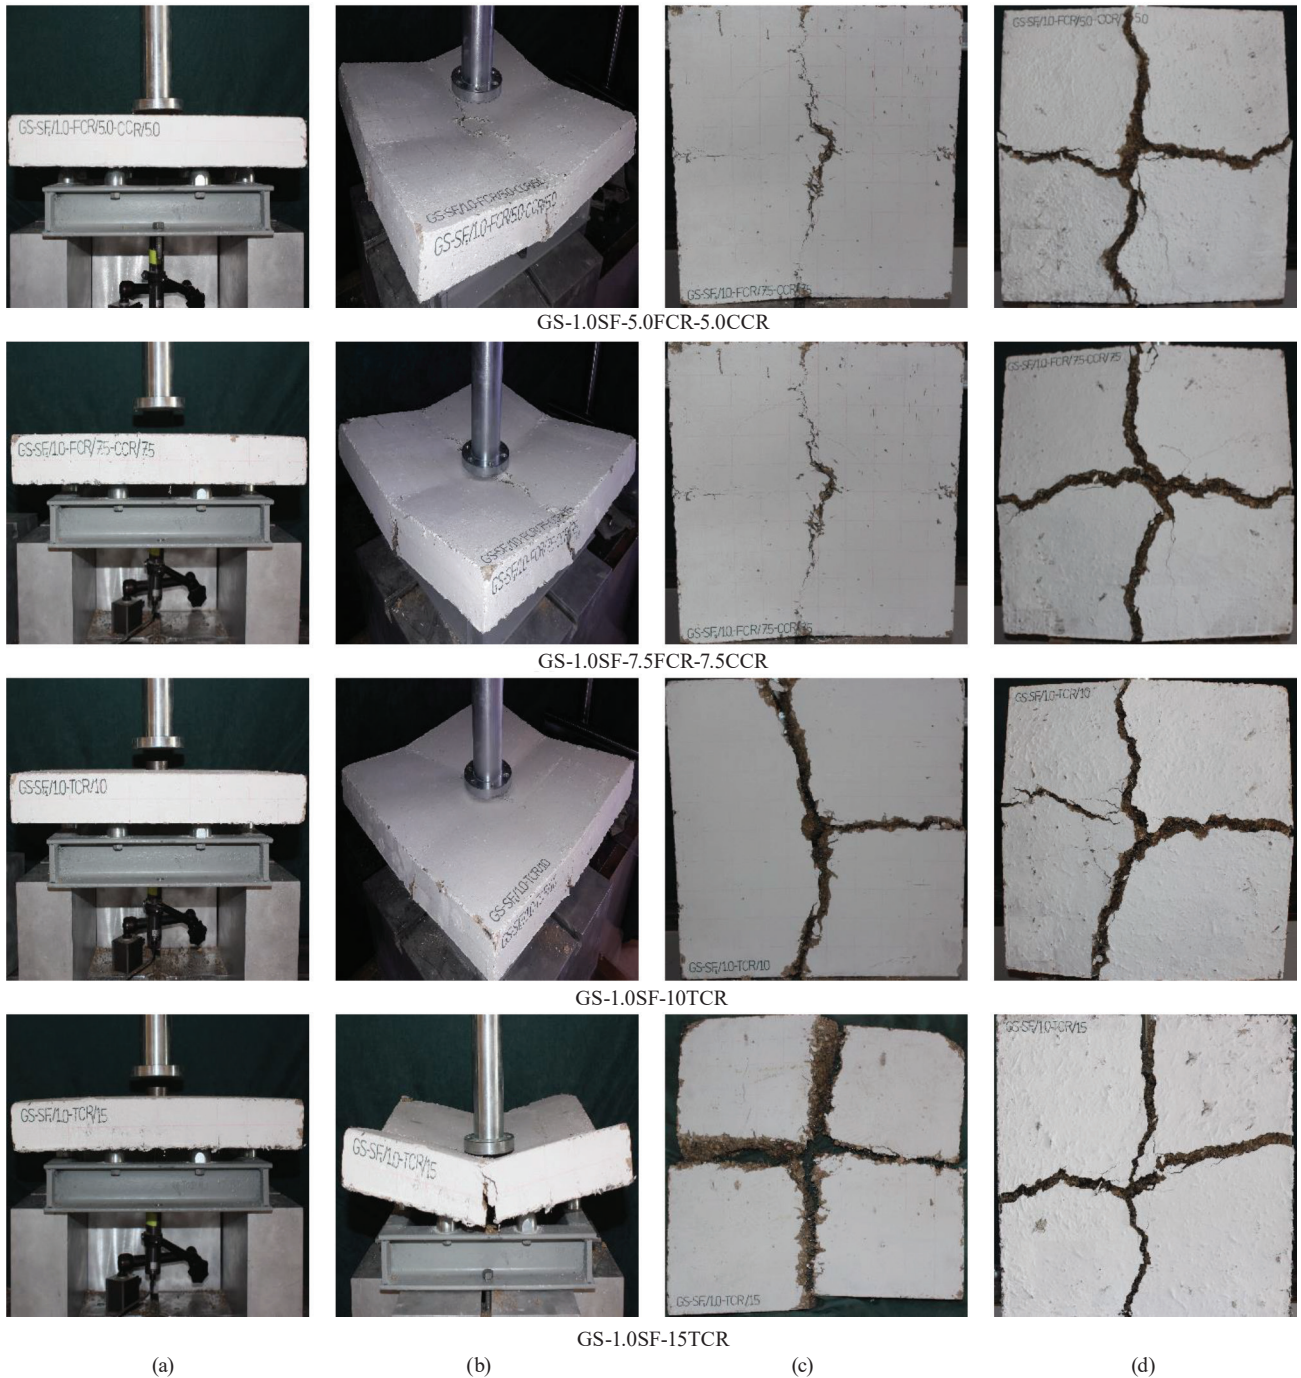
Failure modes of AAC slabs after punching shear tests; (a) Before failure, (b) After failure, (c) Front surface after failure, (d) Back surface after failure
